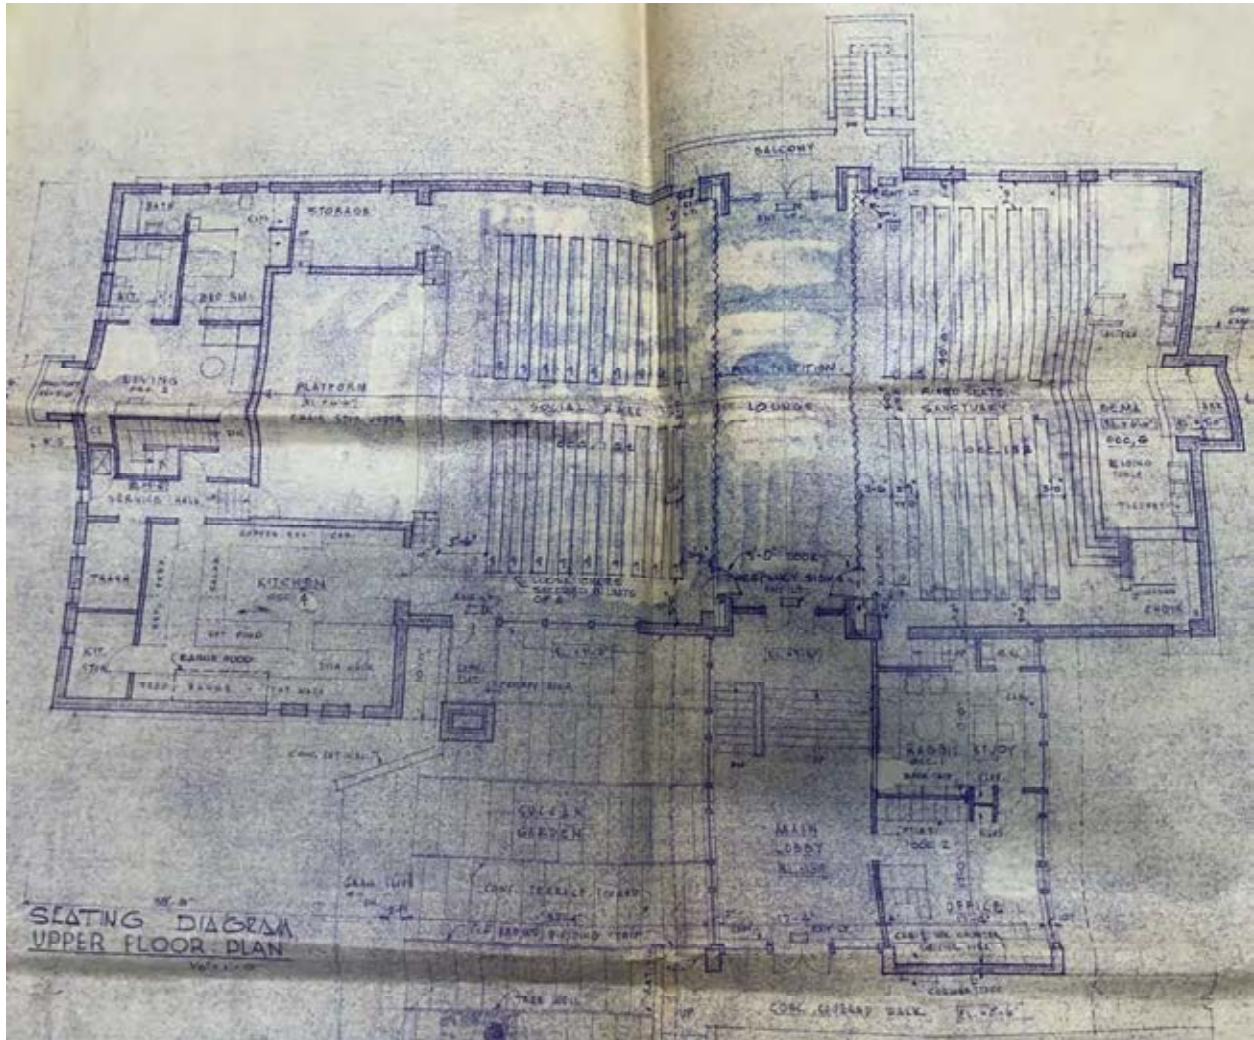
Plan of upper floors, showing foyer level and stairs to upper level
